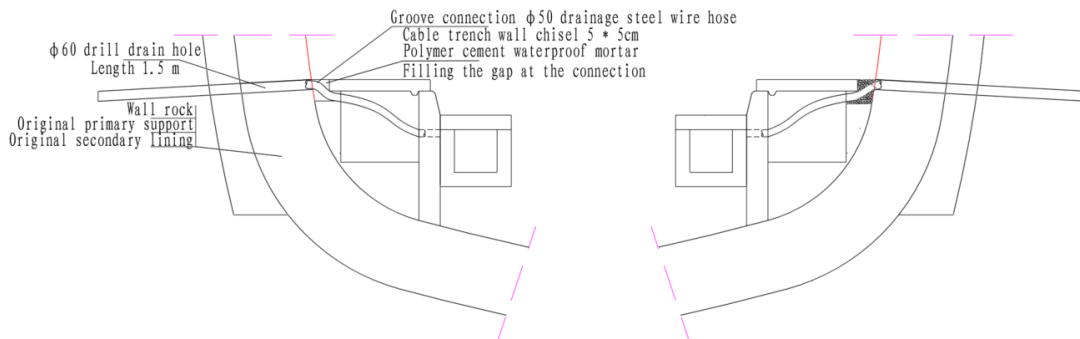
Design drawing of the side wall foot drilling drainage treatment
